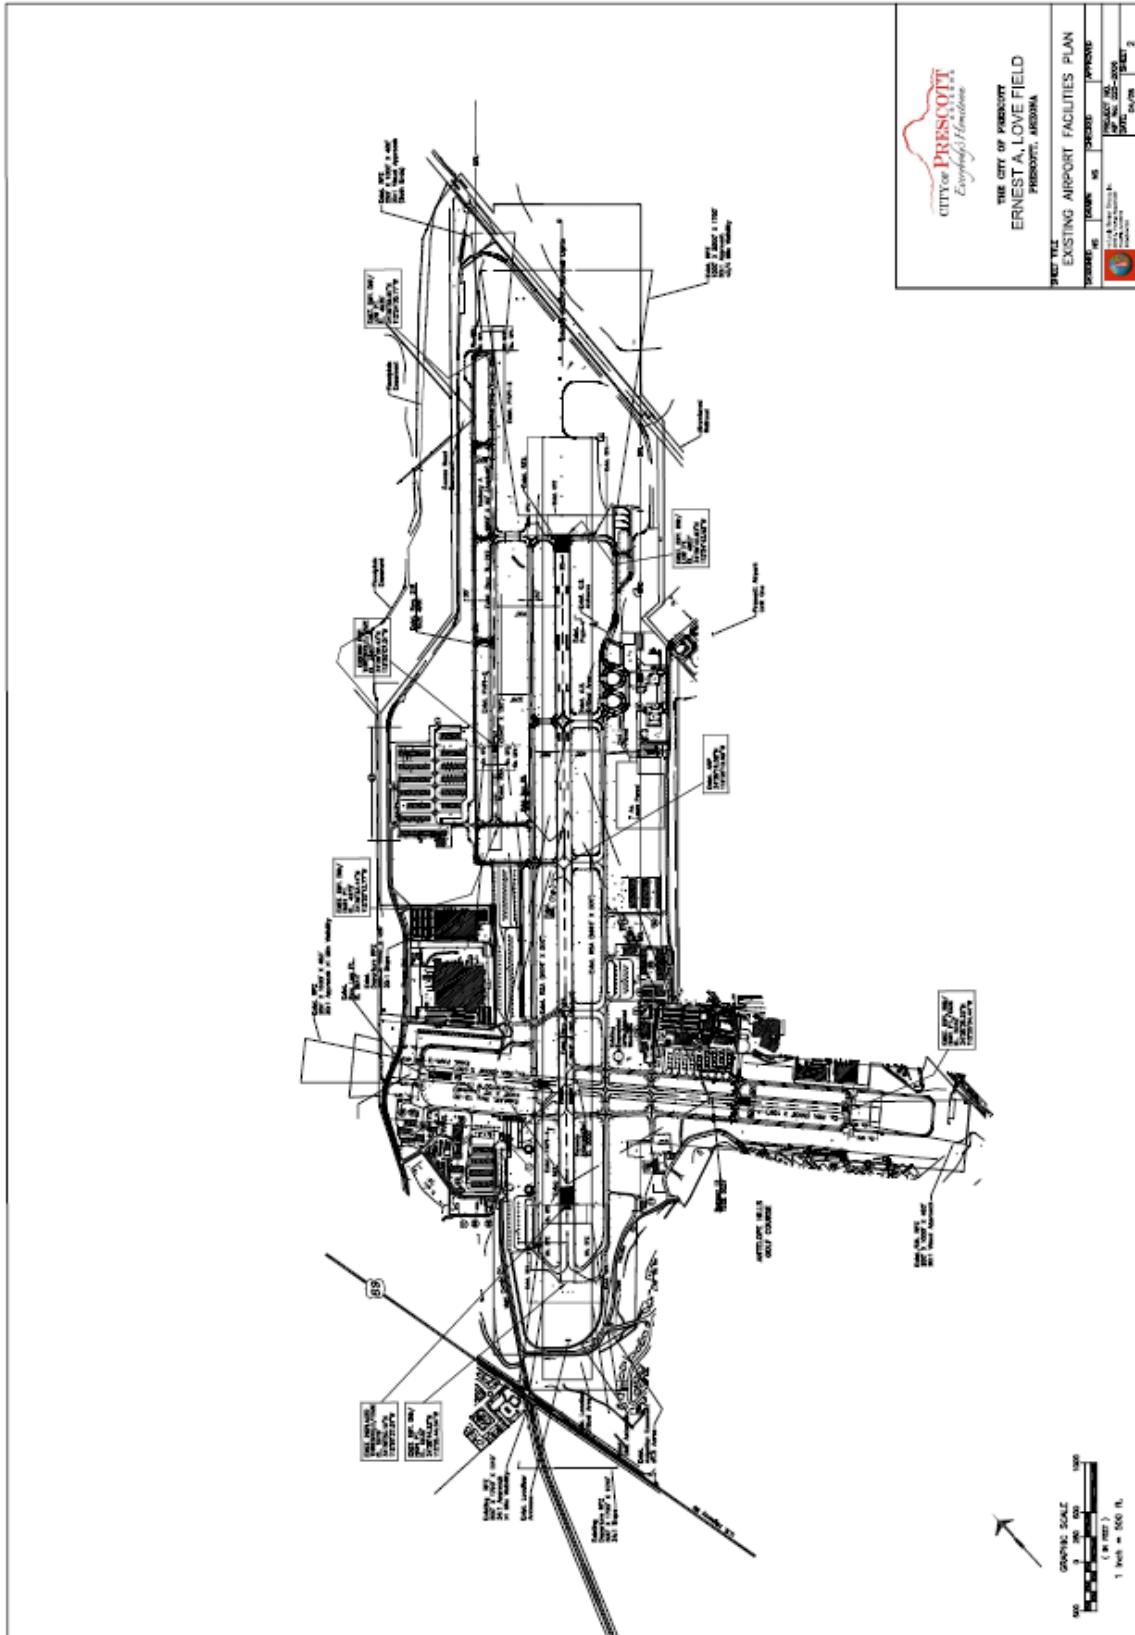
EXISTING AIRPORT LAYOUT
